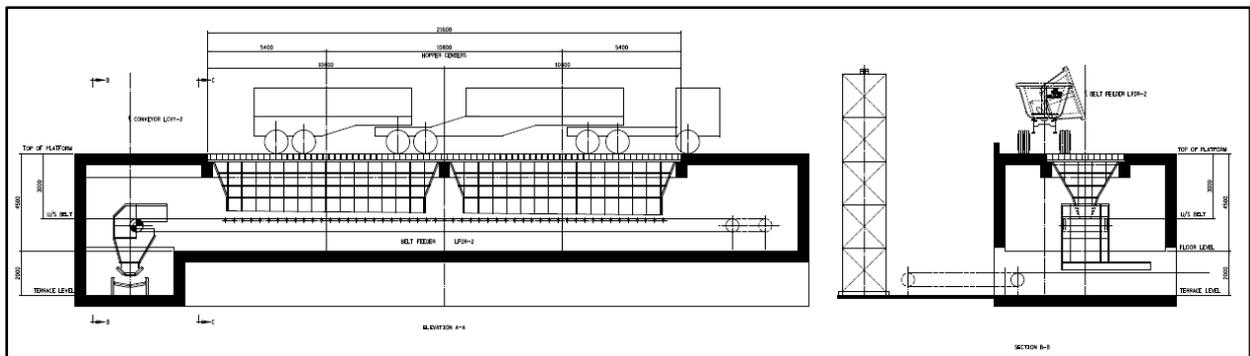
Elevated Limestone Truck Off-loading Facility and Hopper Arrangement
